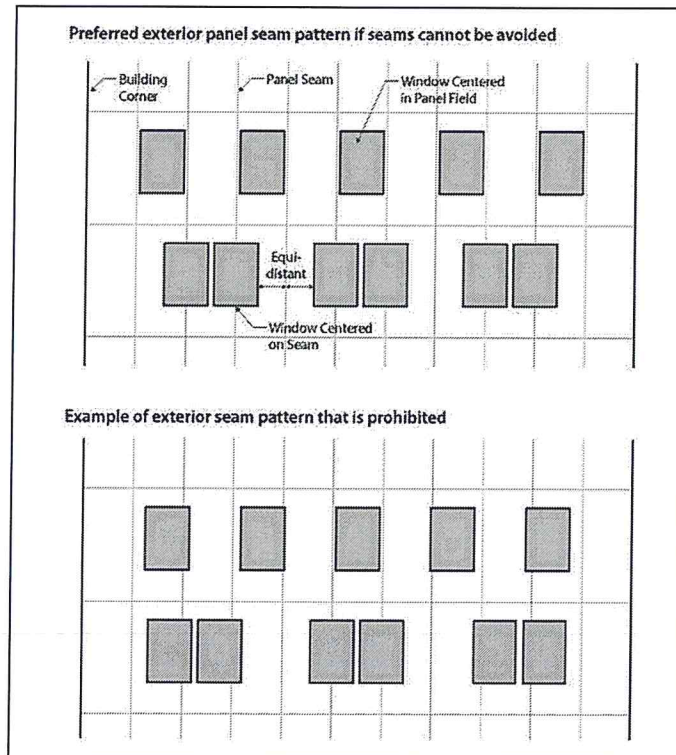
Exterior Walls – Permitted Materials
